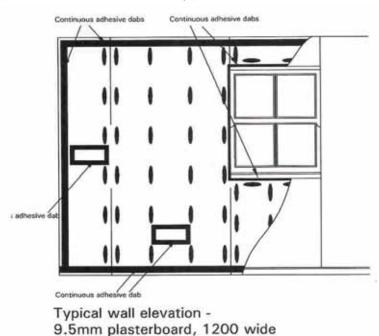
Drawing Detail for Plasterboard Adhesive Dabs
